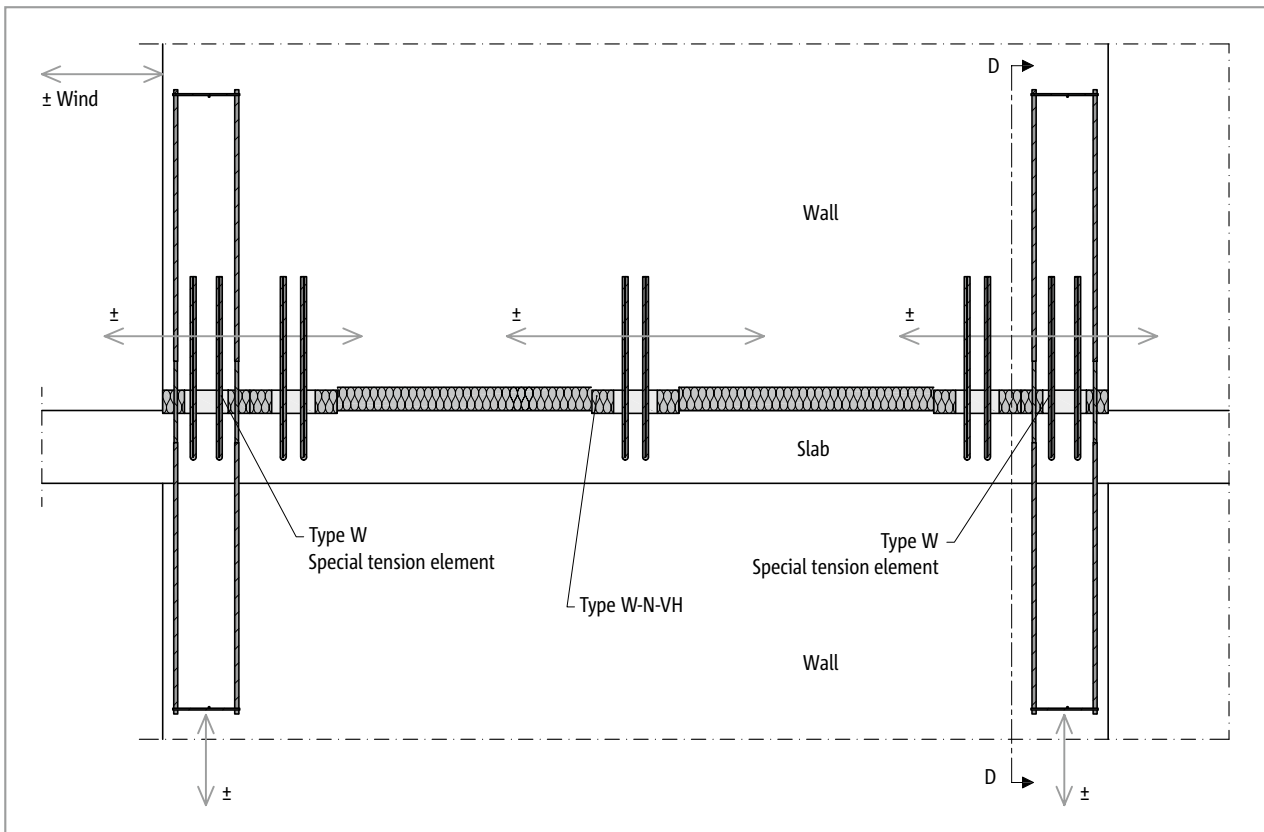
Schöck Sconnex® type W: Combined product variants for the connection of a horizontal, loaded, stabilized wall
